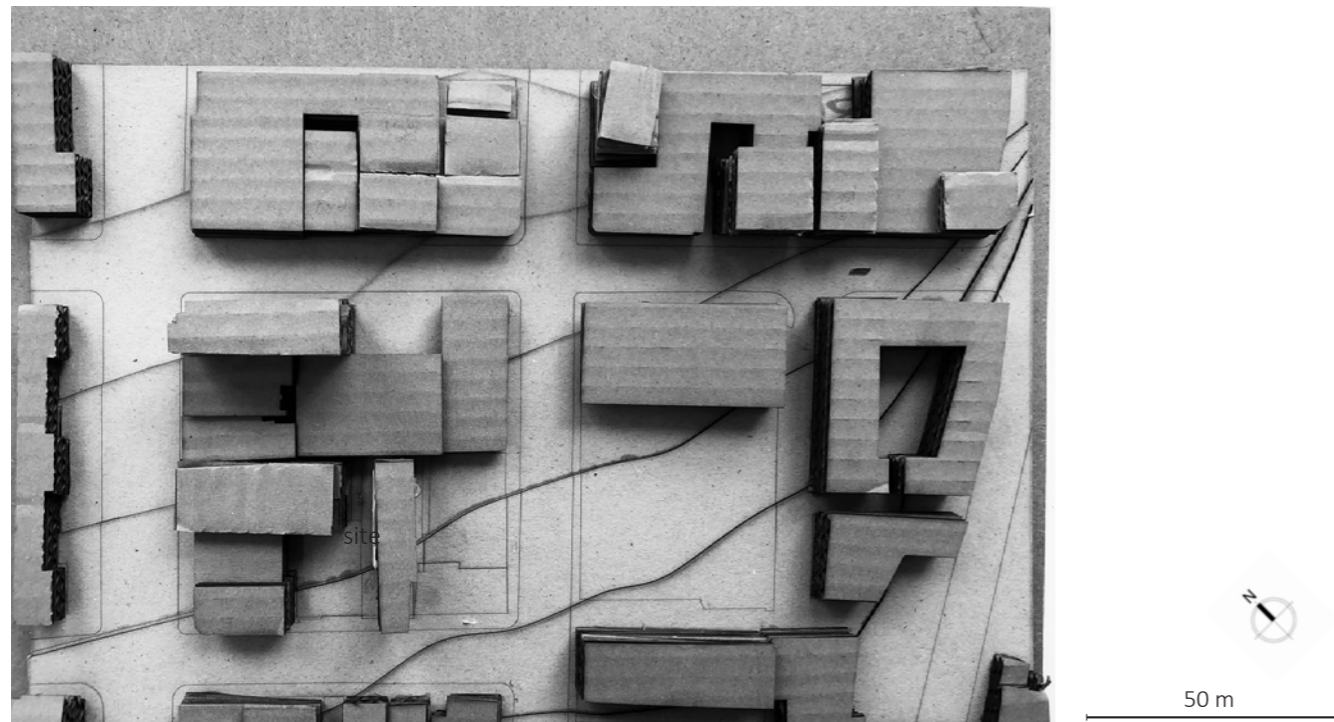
Site model showing existing fabric and urban proposal; proposed building not added to model
